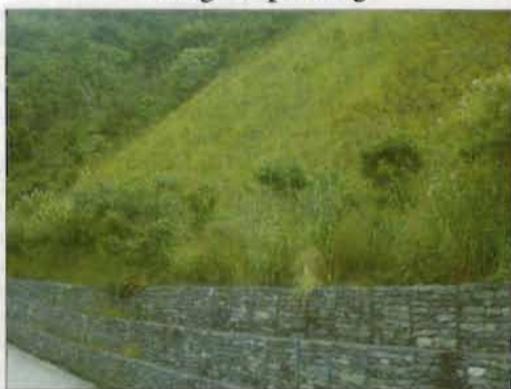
A typical cut slope in deep colluvium on the Dharan-Dhankuta road (eastern Nepal), stabilised using a combination of a gabion toe wall and bio-engineering
